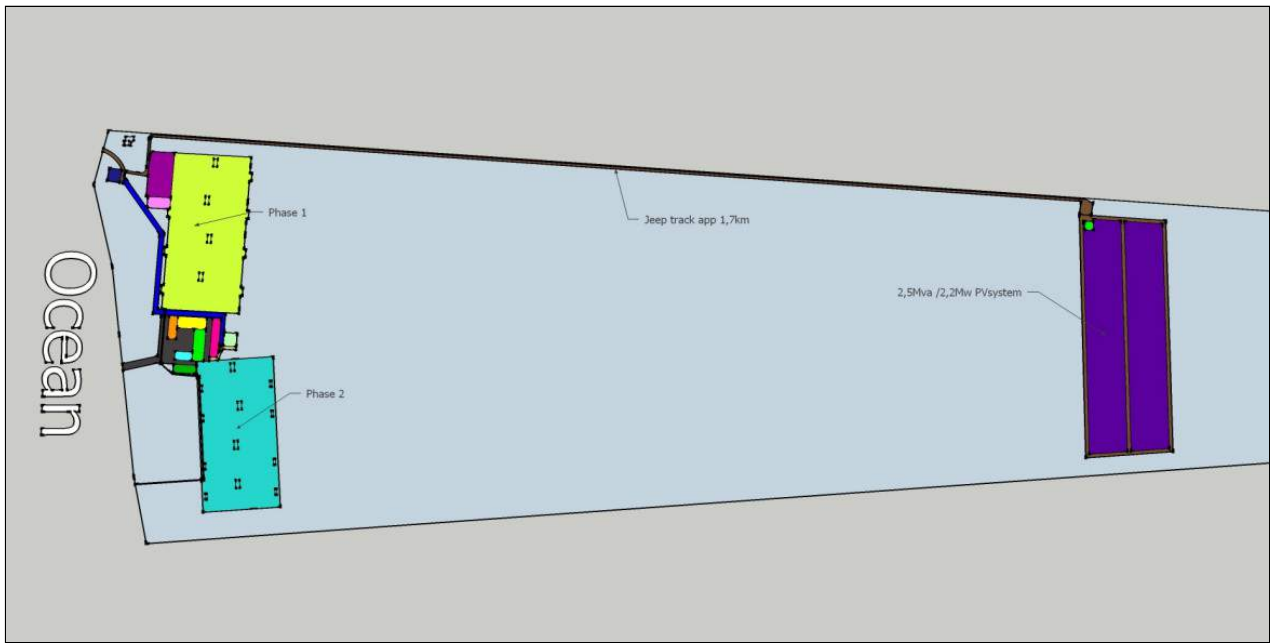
Site Layout Plan (close up) indicating the proposed Alternative 2 (preferred)
